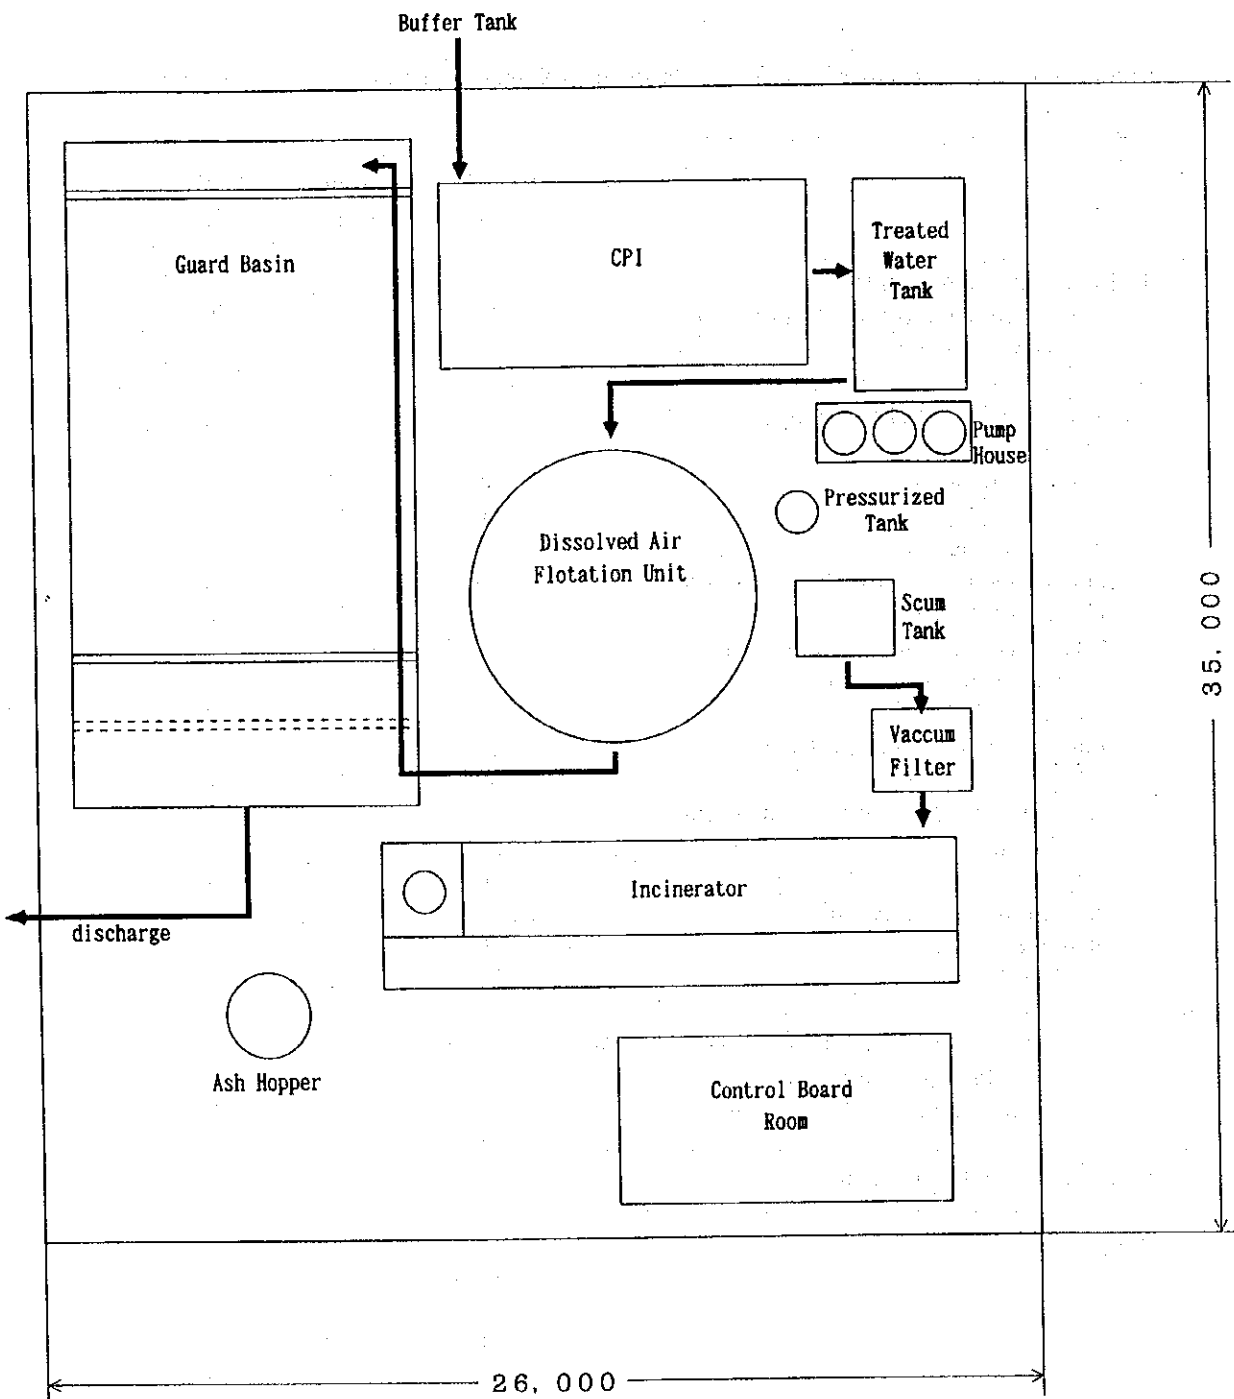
Plot Plan of the Waste Water Treating System (Pointe-a-Pierre Refinery)
